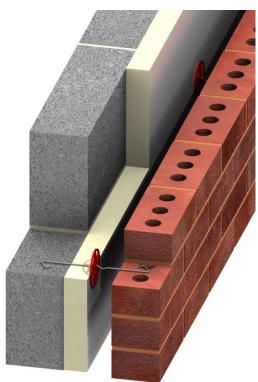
Typical wall ties connecting masonry façade to an internal structural wall [6]
